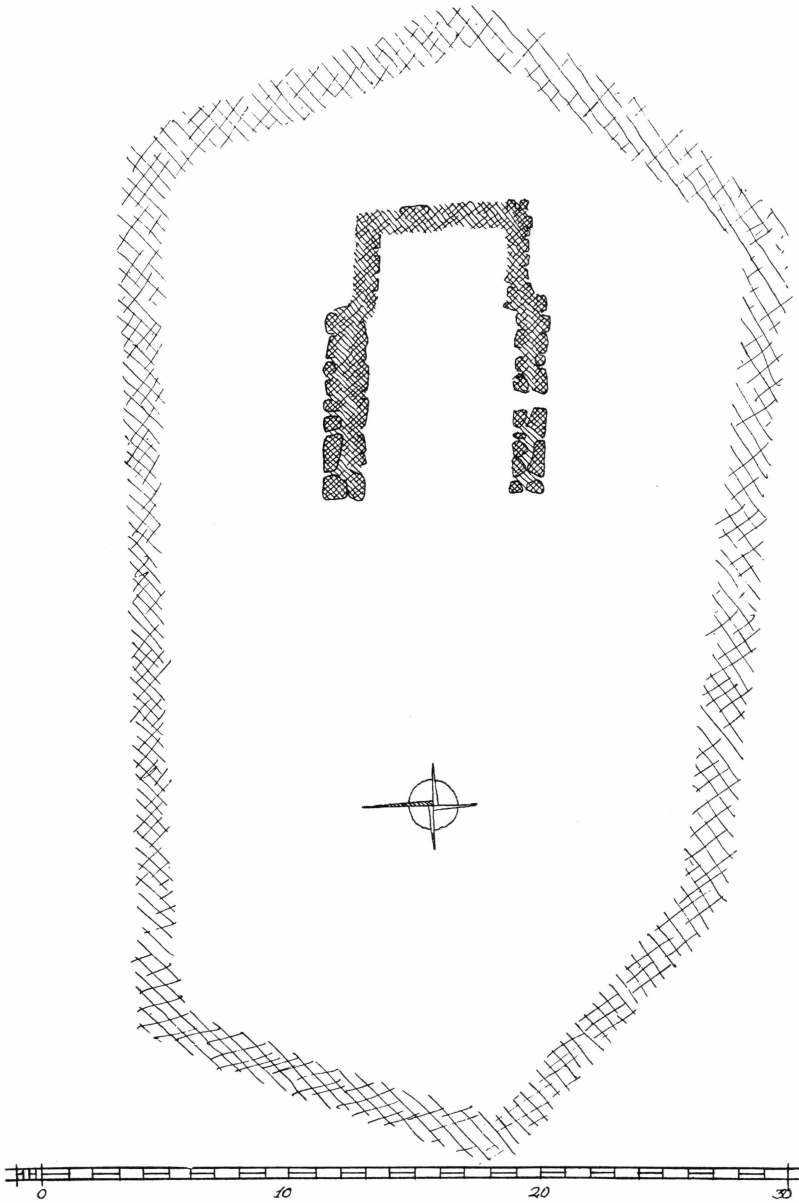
Church and churchyard. Eastern Settlement No. 105. Plan 1:300. (From ROUSSELL, 1941, fig. 74).
